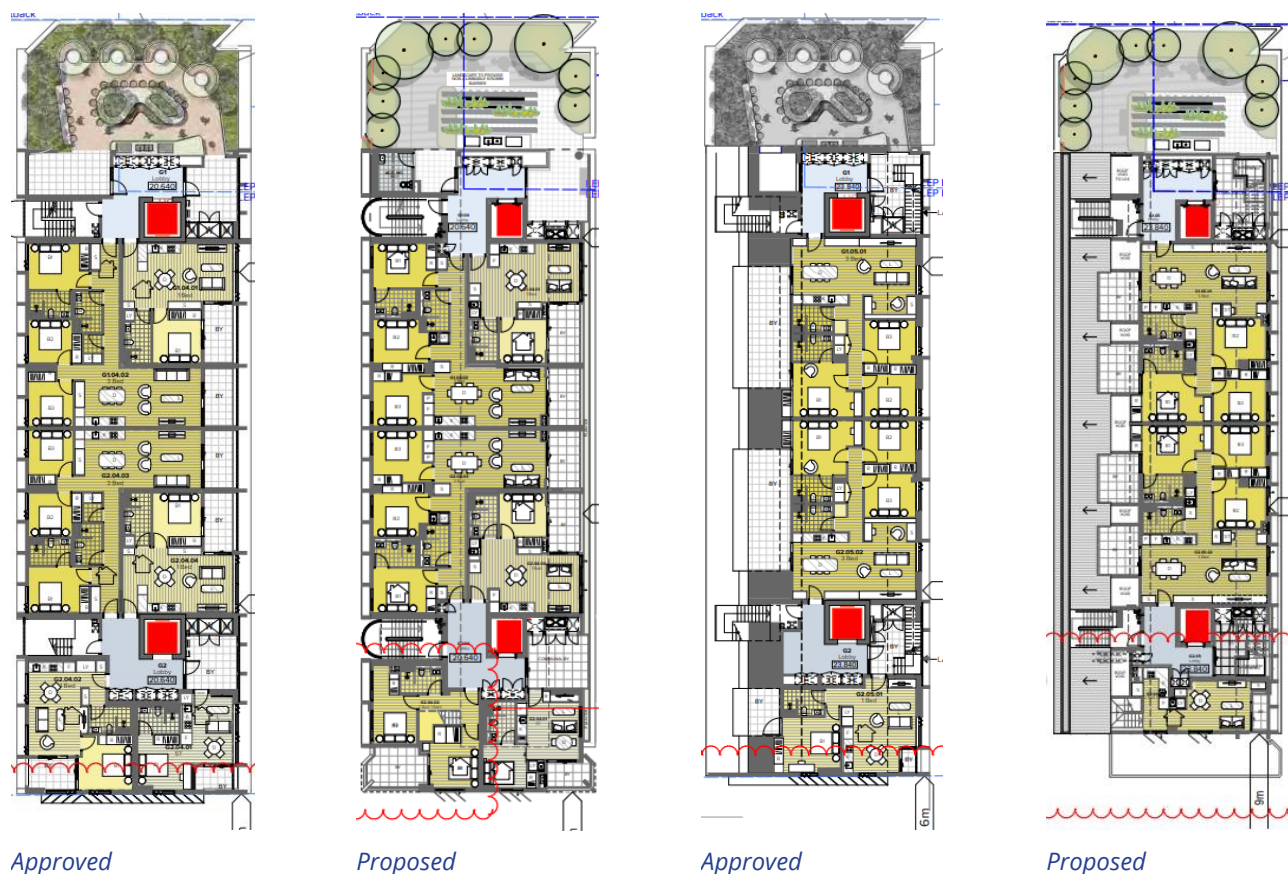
Comparison between approved and proposed Building G Level 4 layout
